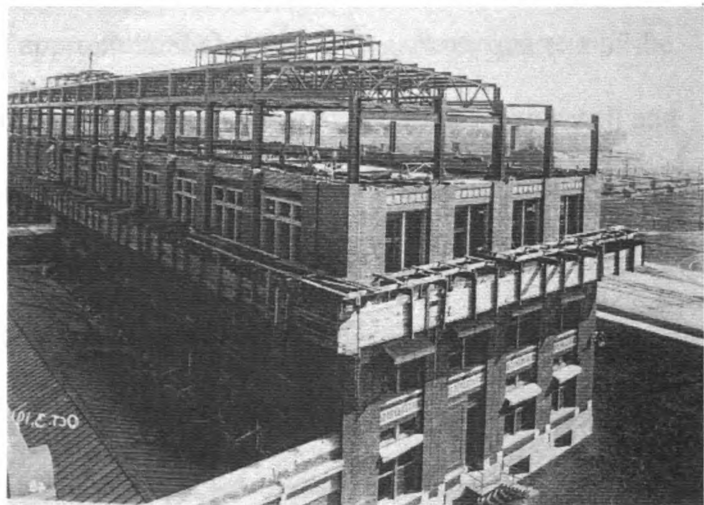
Photo of the construction of the 1913 addition added to the Administration Building. The original two stories were kept, and another two stories were added to the top.
